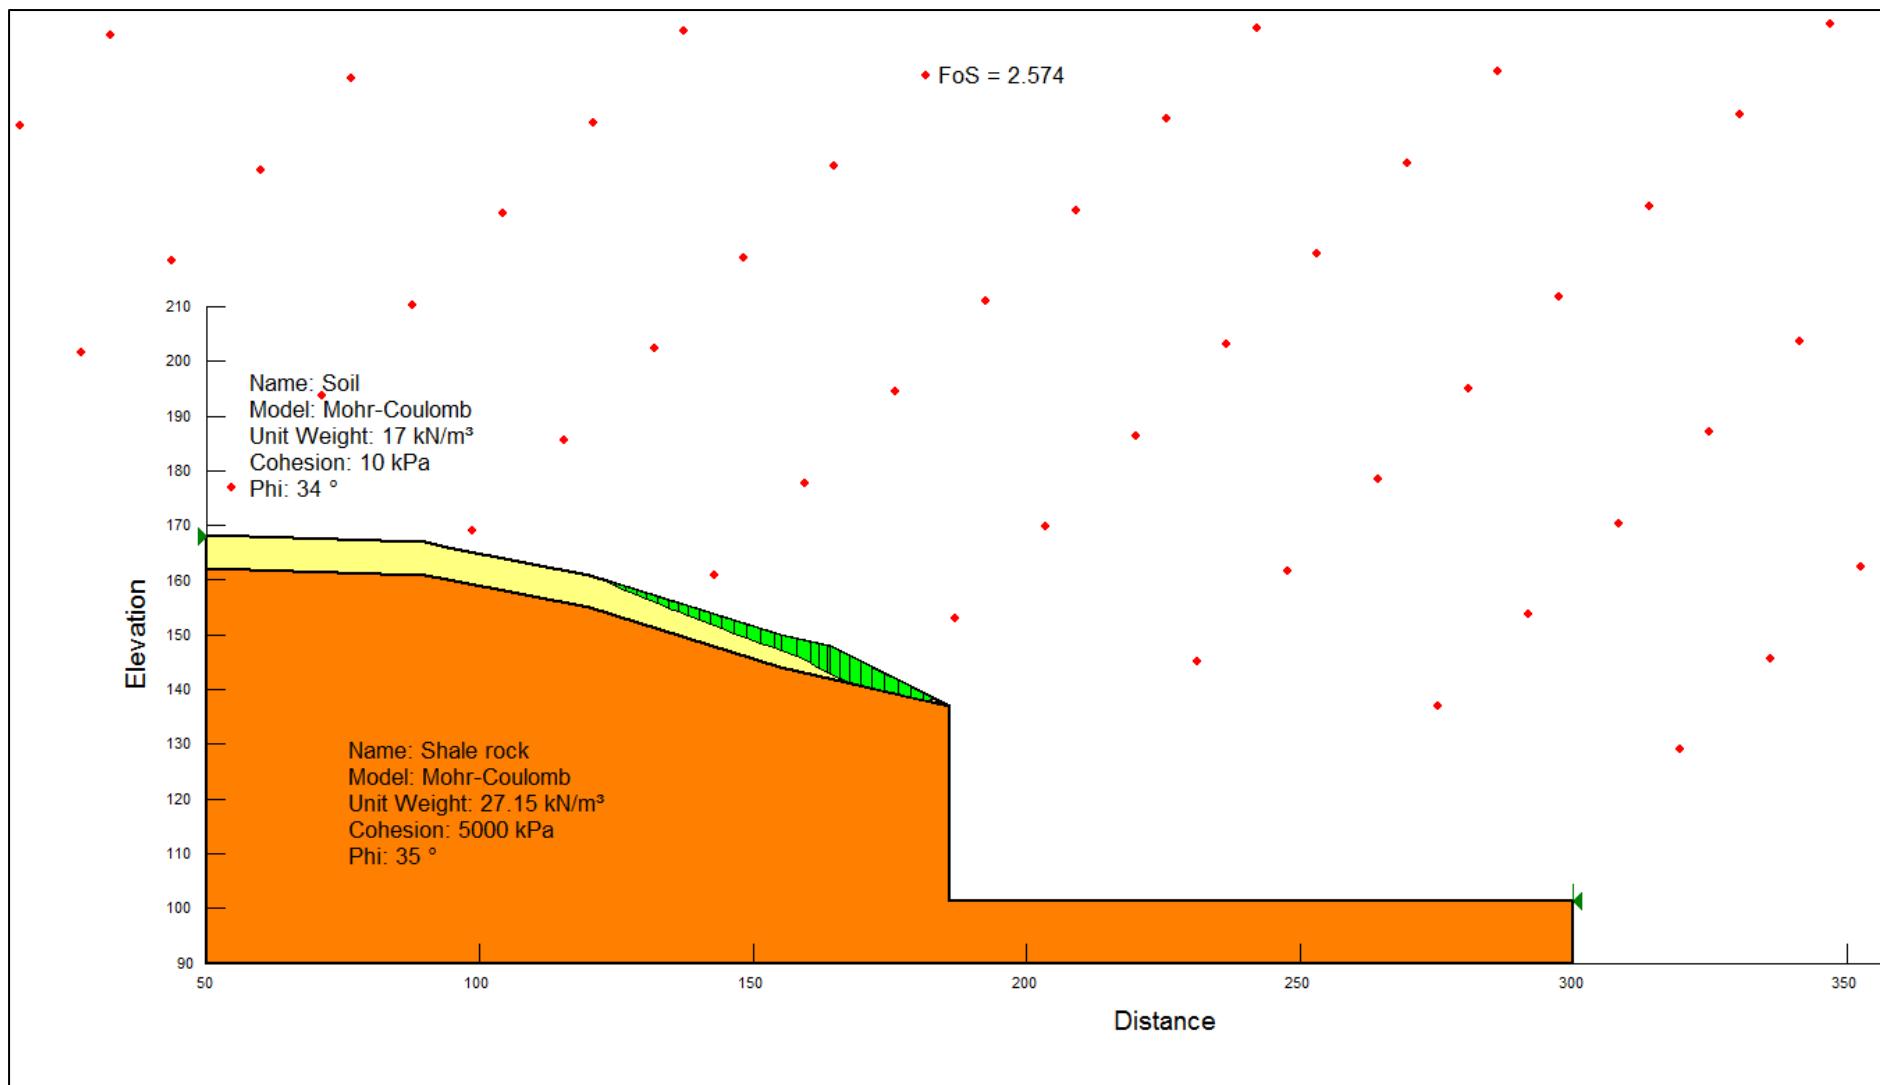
E.20: Outlet portal, Section 2, 90° excavation in shale, 1:2 excavation slope in soil
